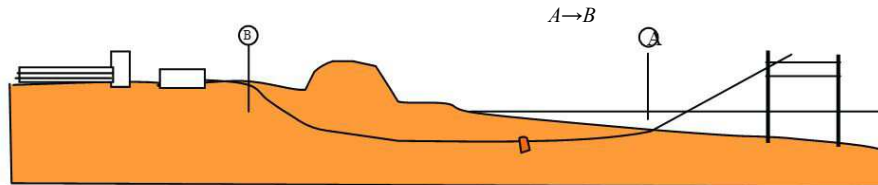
Cofferdam for pulling of pipeline on shore at the Kirinskoye field, Sakhalin Island
